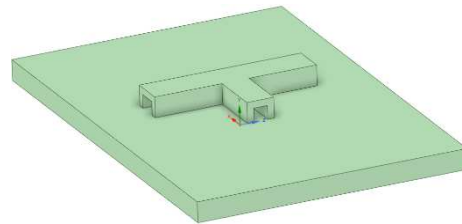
T-intersection tunnel geometry created in Spaceclaim®
